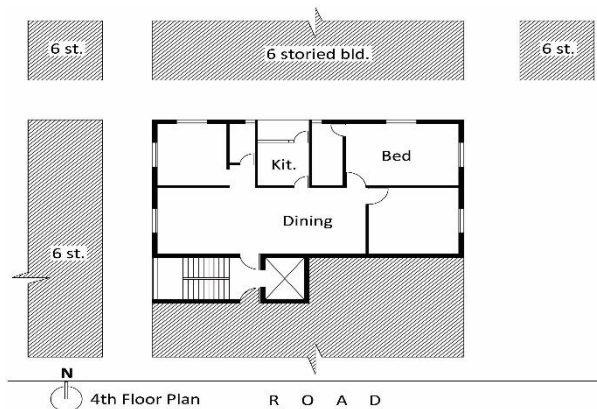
Plan-C where dining room has single-sided ventilation and bed room and kitchen are separated by a buffer space
